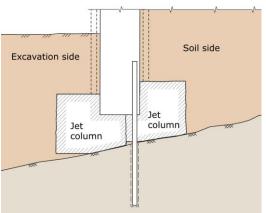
Sealing of transition between bedrock and sheet pile (NGF, 2019).
